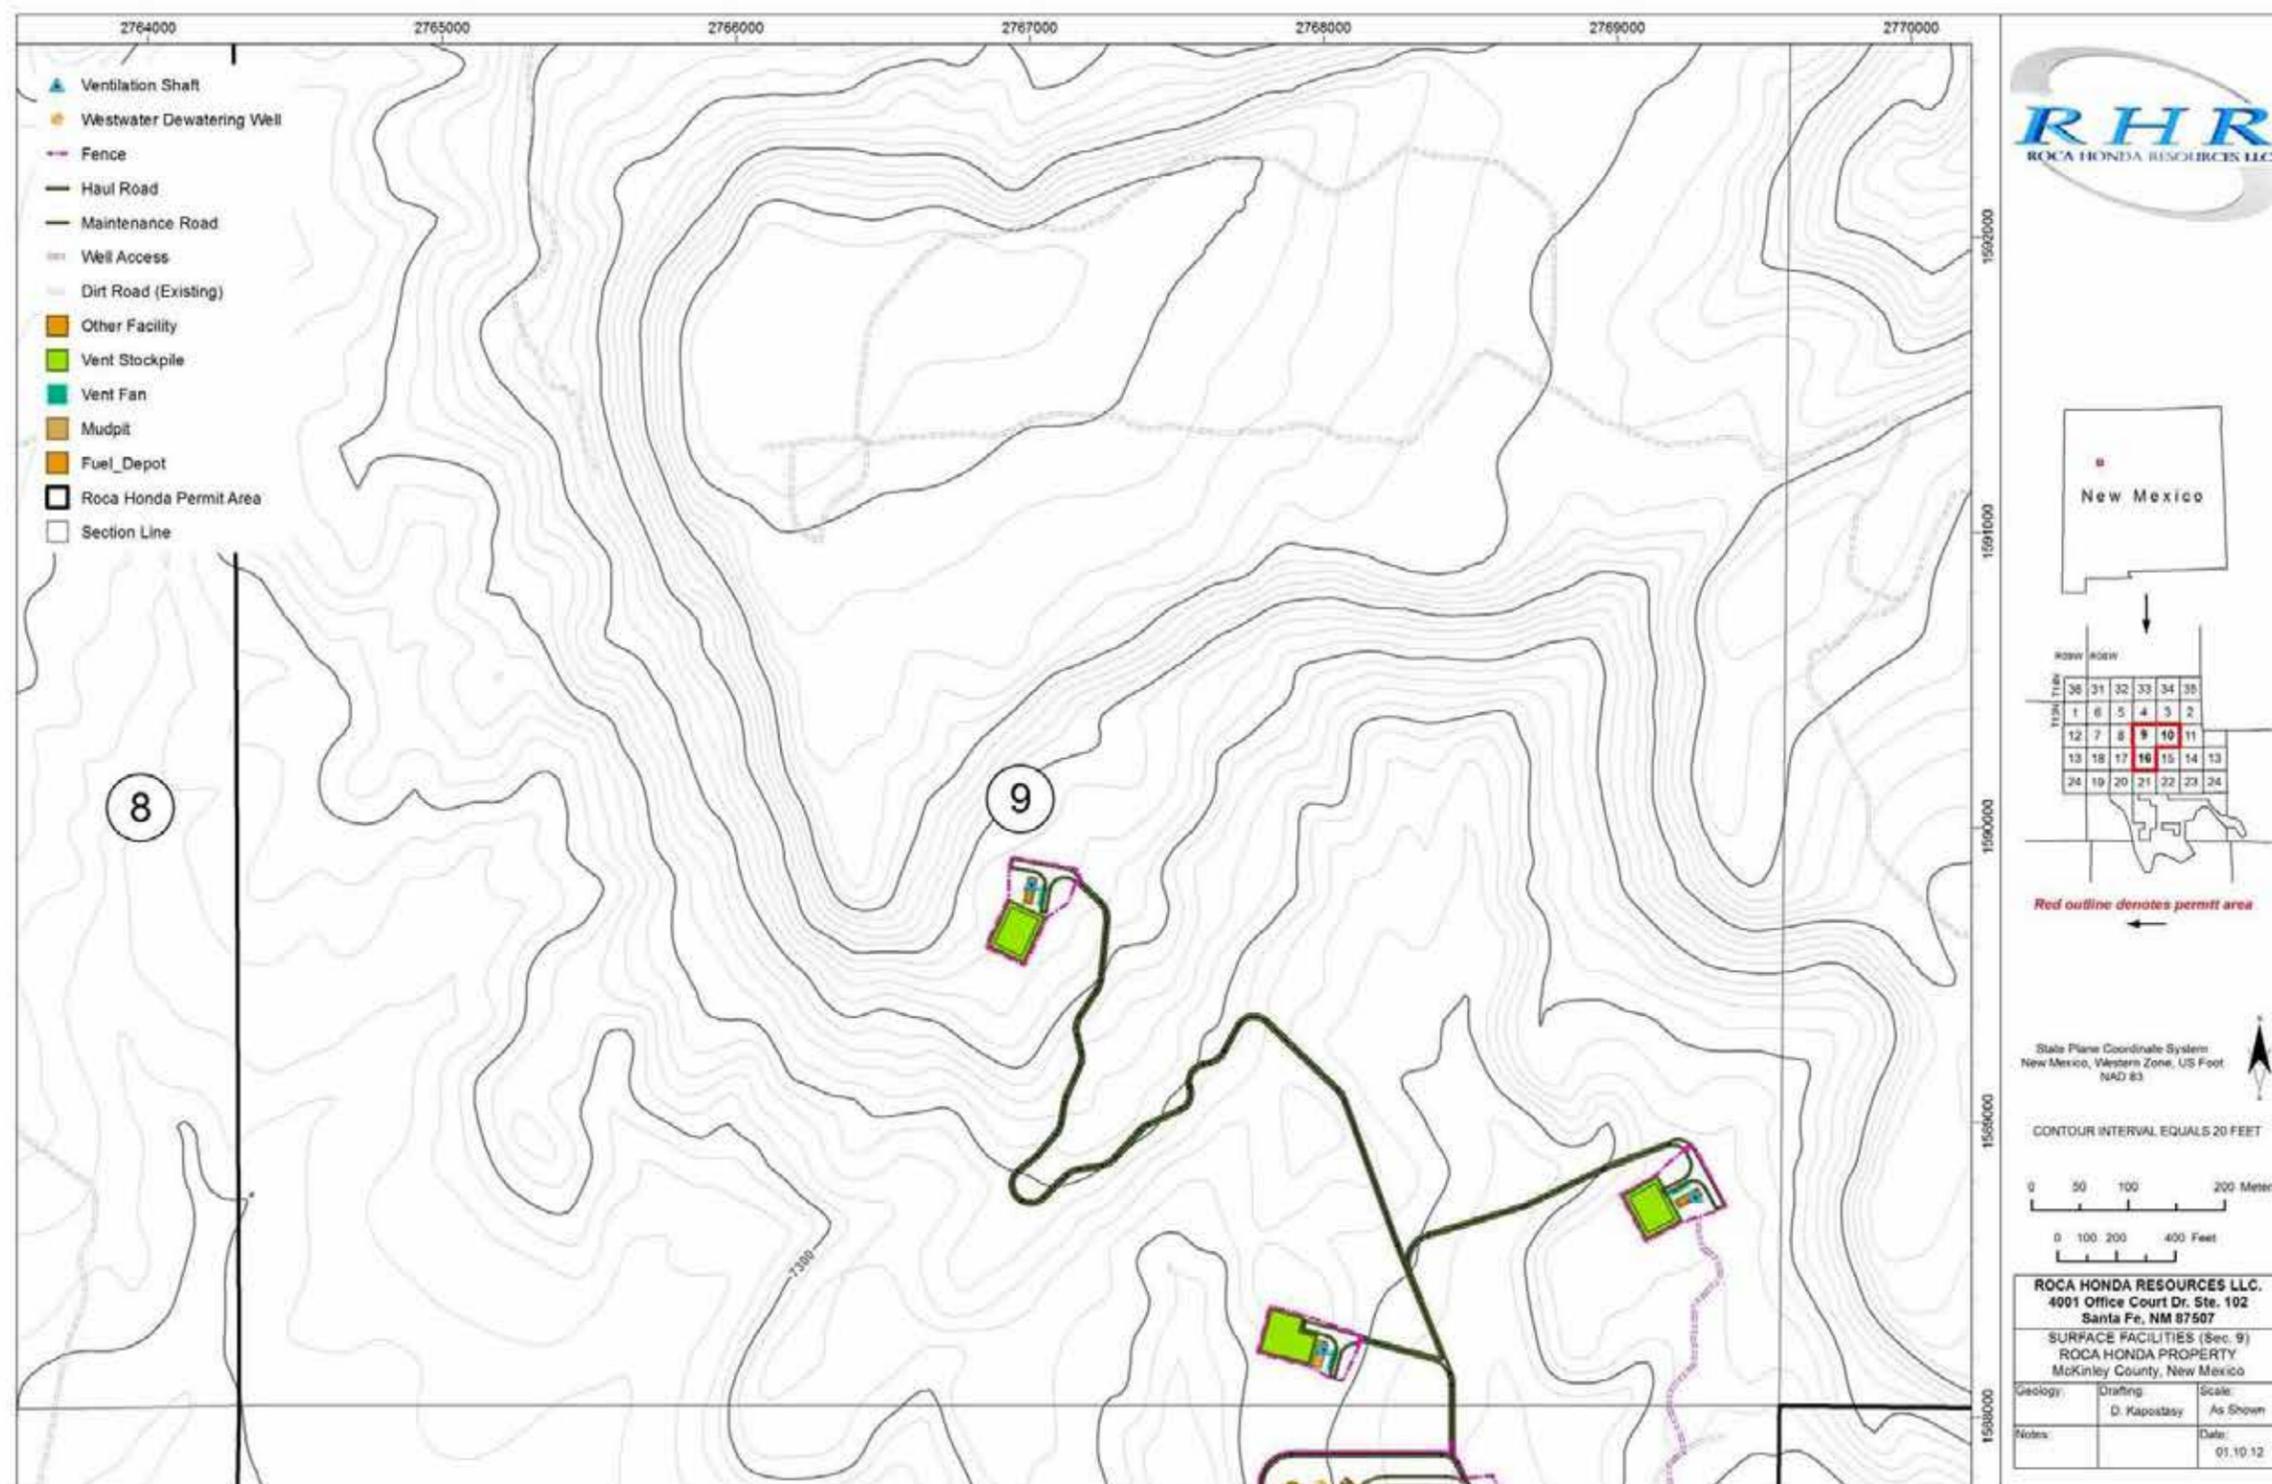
Layout of surface facilities in Section 9 for the proposed Roca Honda Mine
